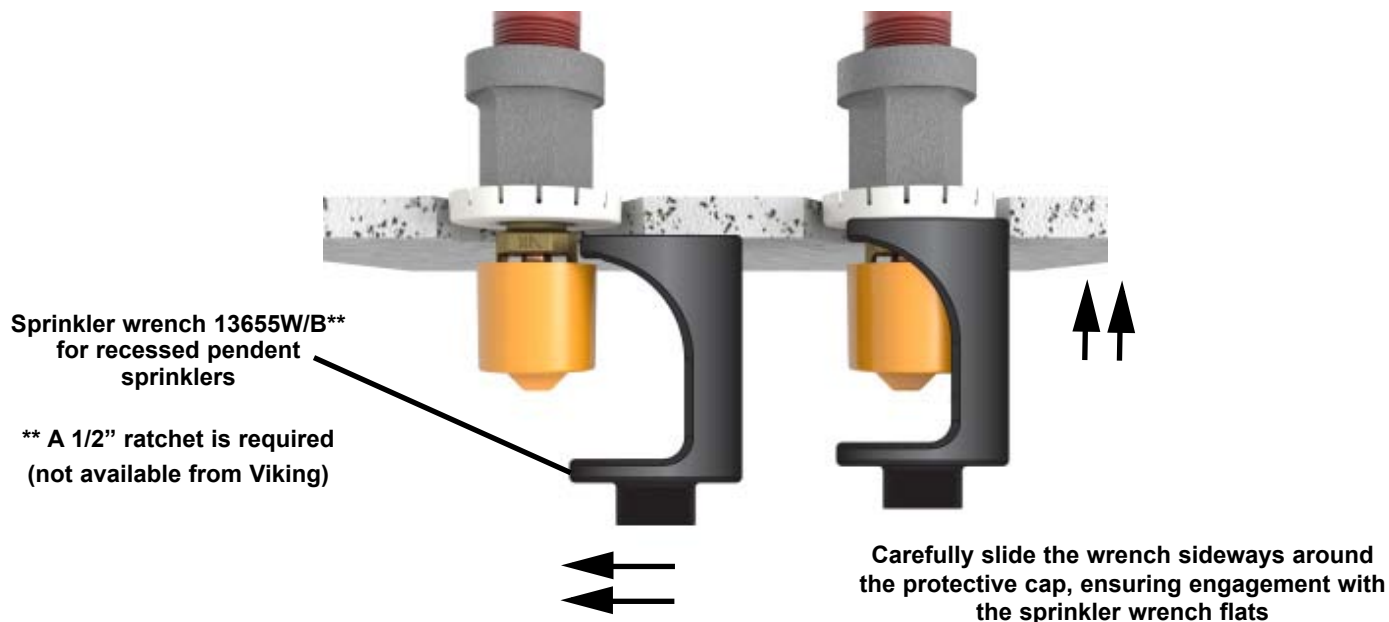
Wrench 13655W/B for Recessed Pendent Sprinklers
